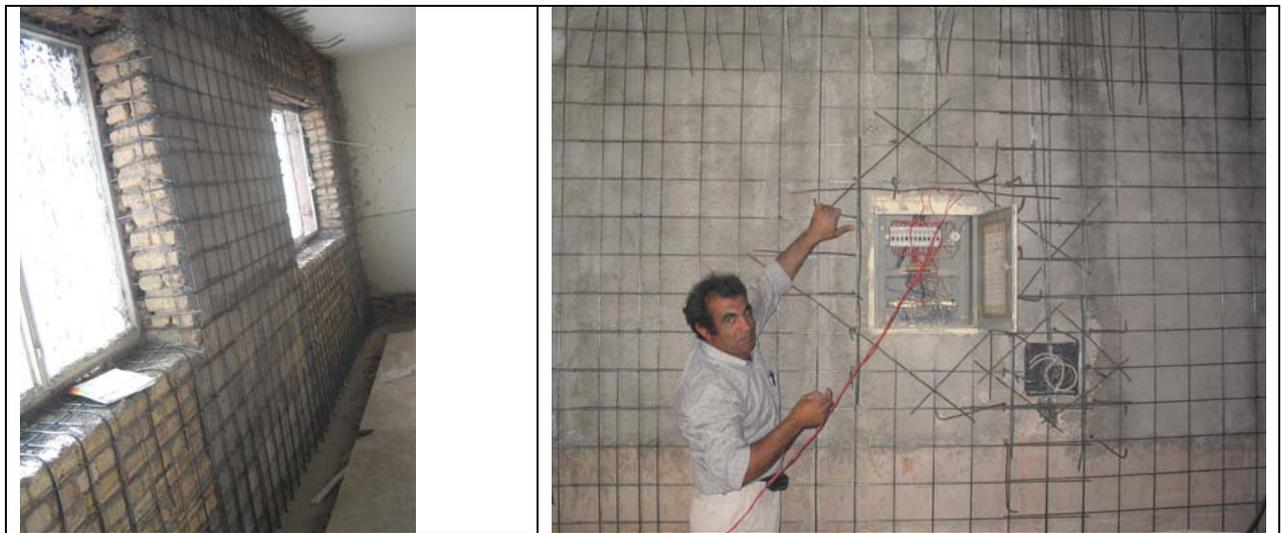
(left) A typical view of the enhanced bearing wall around the openings, (right) A typical view of the enhanced bearing wall around the electrical equipments box.
